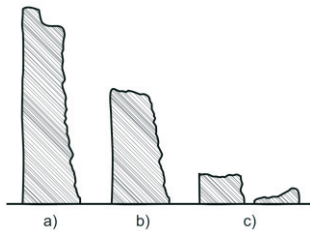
The division of walls with respect to height: a) a high wall, b) a medium wall, c) a low wall
